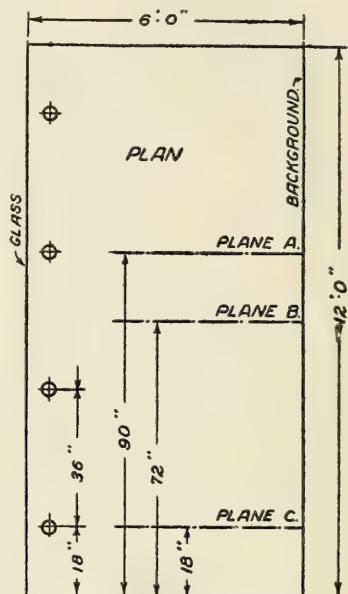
Plan of Class C window showing location of test planes and ceiling outlets.
